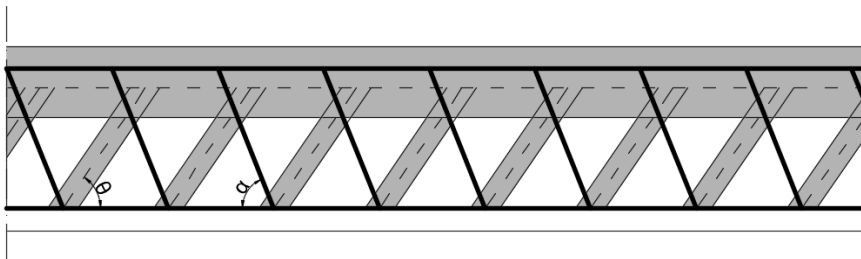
Strut model for computing the shear capacity in a RC structural element
